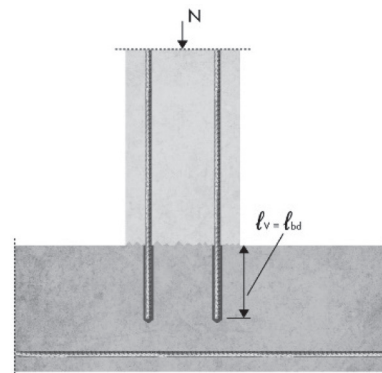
Rebar connection of components stressed primarily in compression. The rebars are stressed in compression
